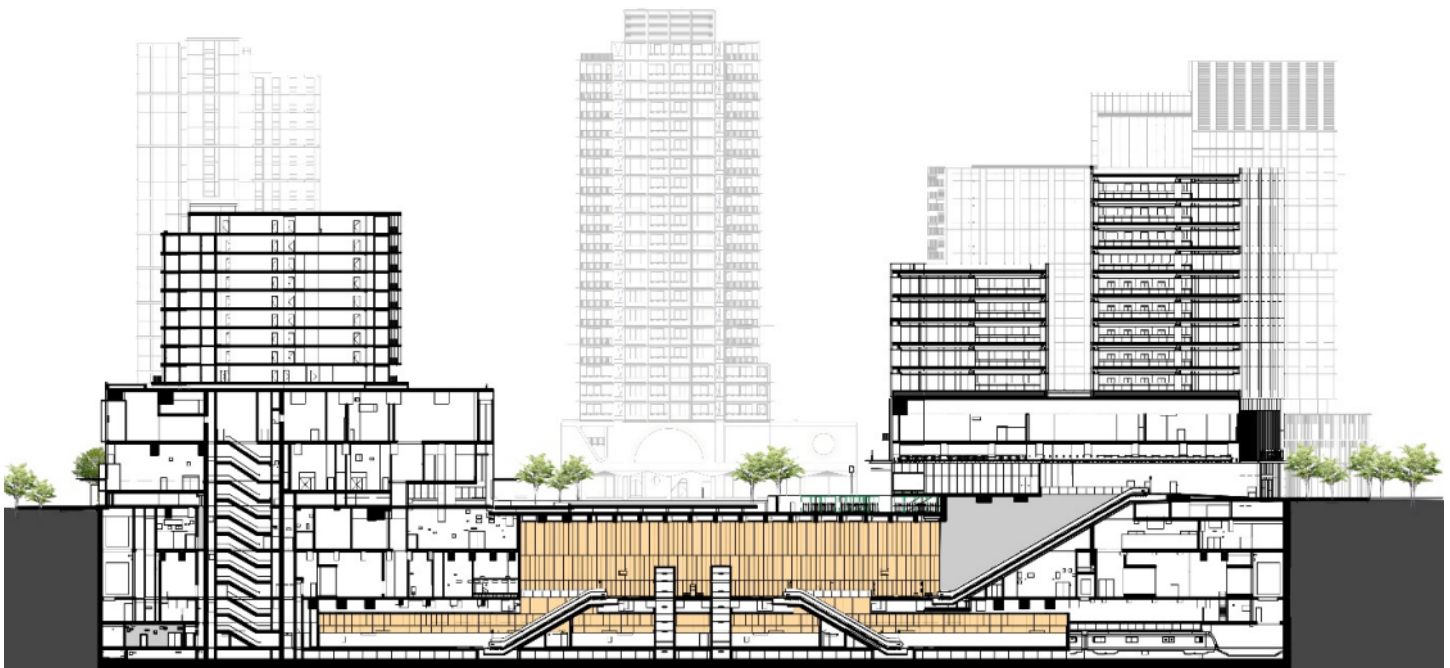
Longitudinal Cross-Section of the Waterloo Metro Station and Waterloo Metro Quarter.²⁸³
